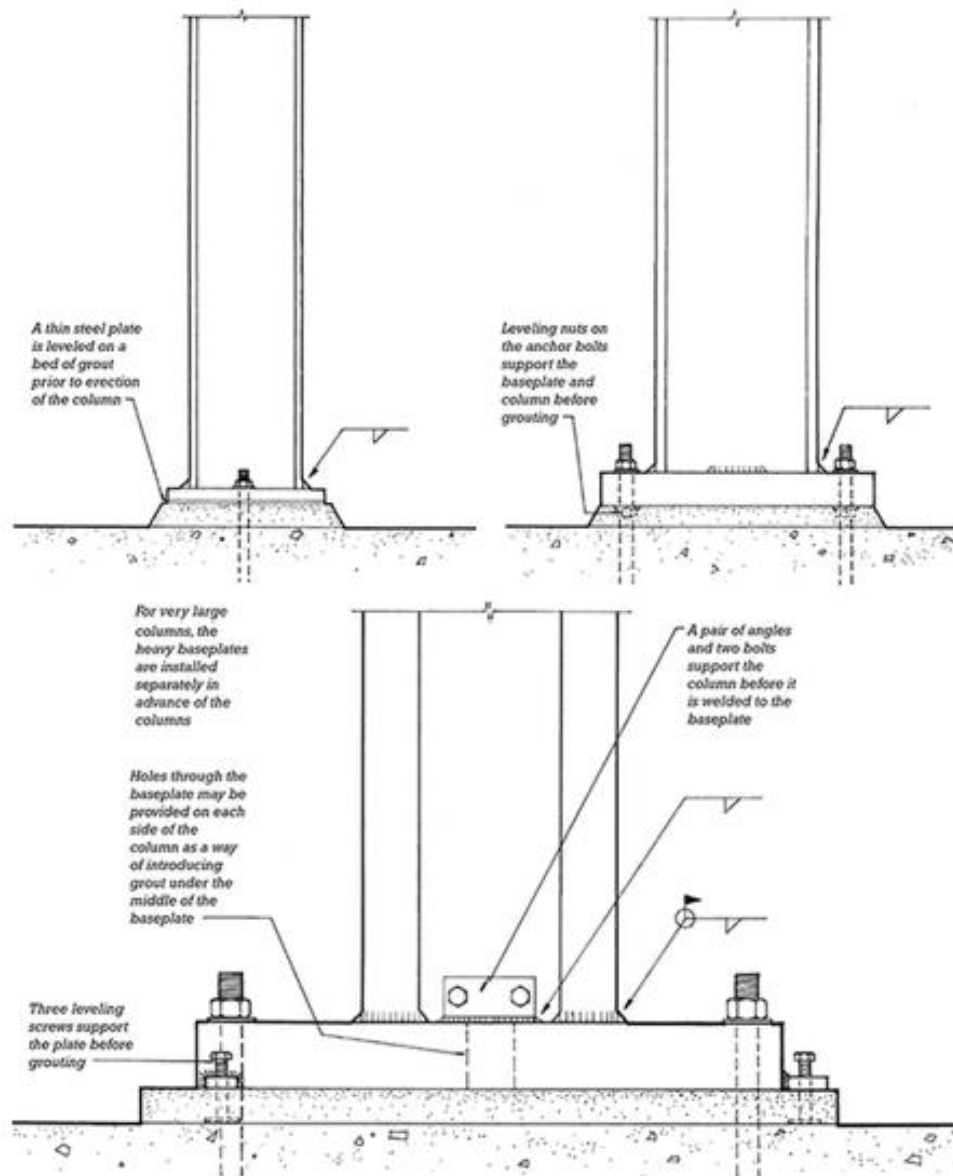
Three typical column base details. *Upper left:* A small column with a welded baseplate set on a steel leveling plate. *Upper right:* A larger column with a welded baseplate set on leveling nuts. *Below:* A heavy column field-welded to a loose baseplate that has been previously leveled and grouted.
